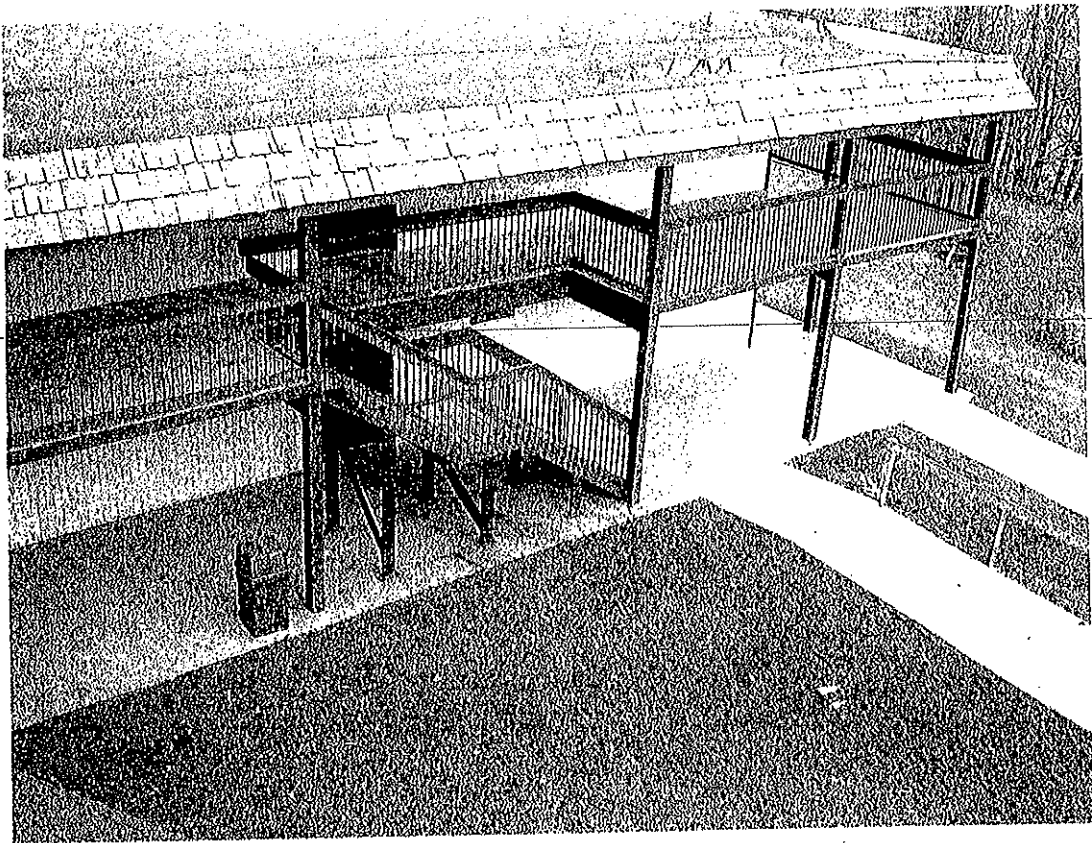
View of Stairs and Balcony of Wild Goose Lodge
